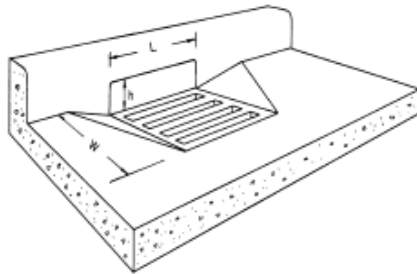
Types of Storm Drain Inlets (FHWA – HEC-22 2001)
